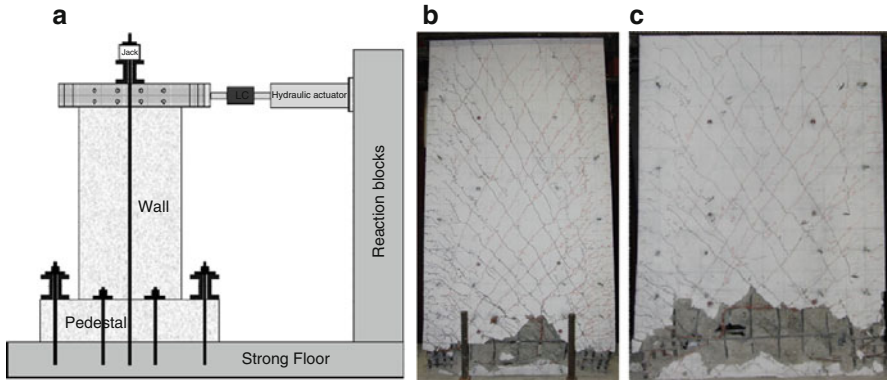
Medium-rise wall tests by Tran and Wallace (2012): (a) test setup, (b) damage on Specimen RW-A20-P10-S63, (c) damage on Specimen RW-A15-P10-S78
